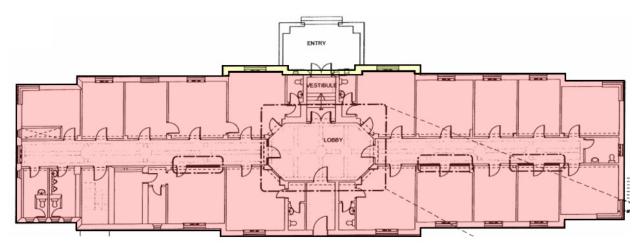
Diagram showing retained sections of the building for Option 6 'façade retention of only part of the building's primary, north elevation'
